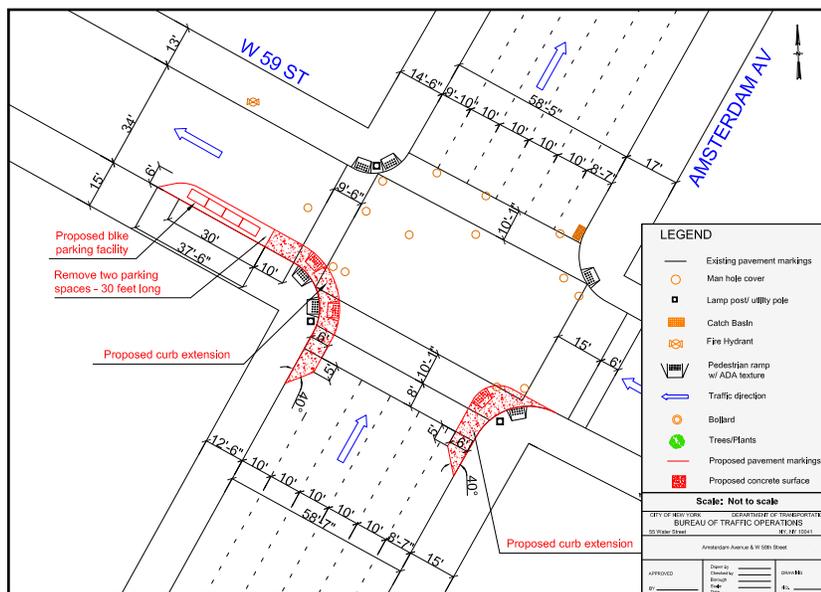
Proposed On-Street Bicycle Parking – West 59th Street & Amsterdam Avenue
